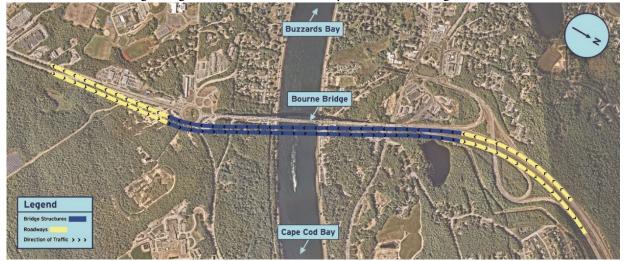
Bourne Bridge Replacement Mainline Alignment Location
